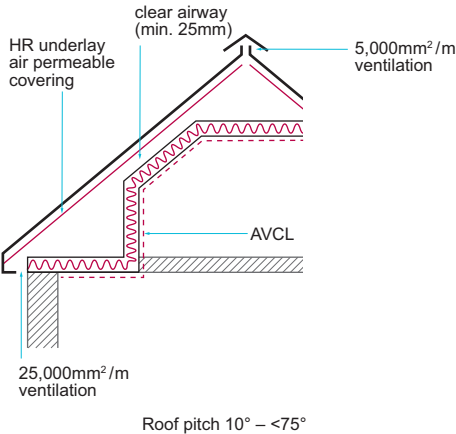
Hybrid roof - Room in roof (flat roof dormer)
